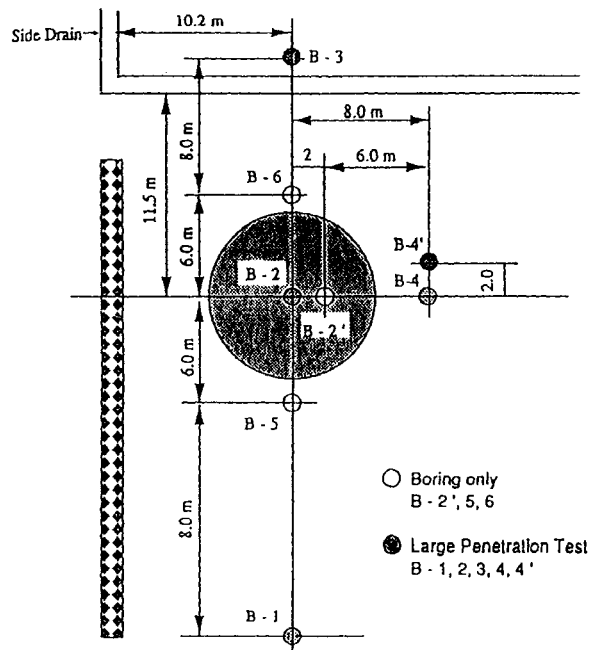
Location of Penetration Test and PS-logging Before Excavation
